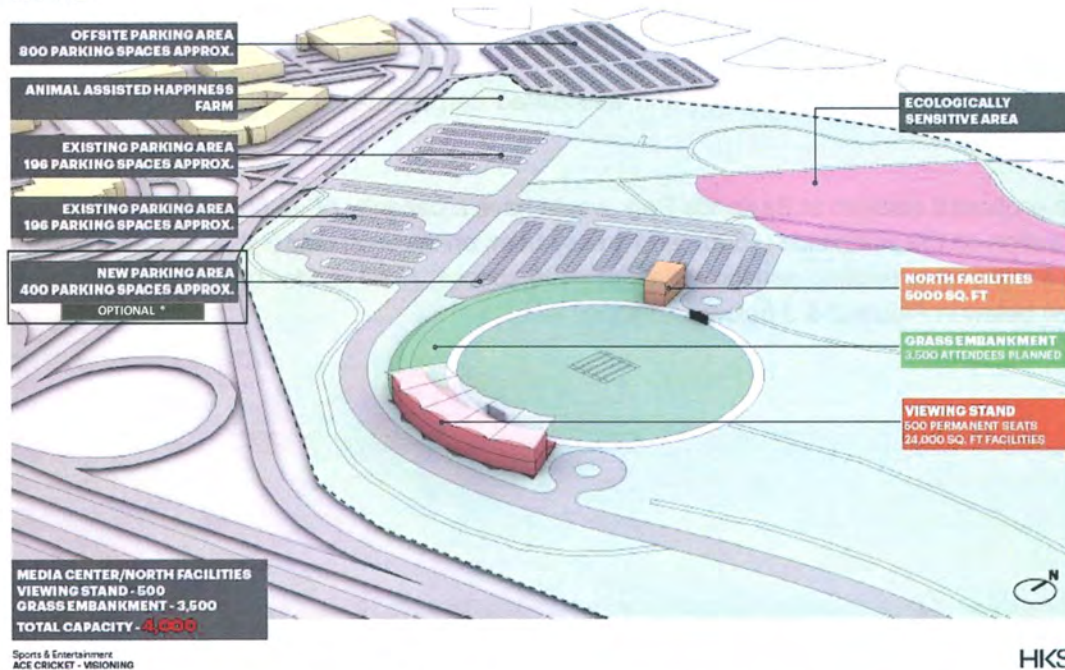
3D model of Baylands Park site with proposed stadium and car park (HKS Architects)
